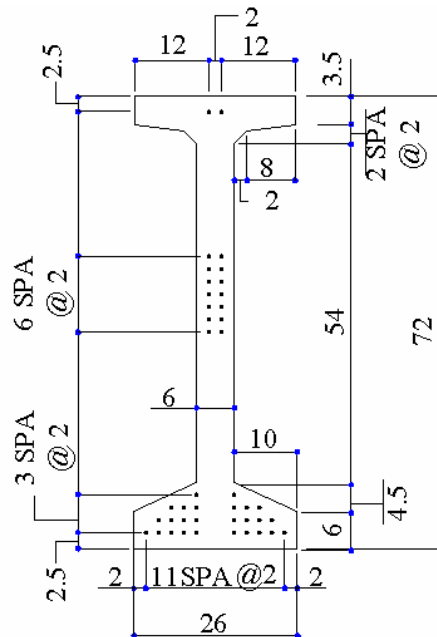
Dimensions and strands location of SCC BT-72 beams. Dimensions are in inches
